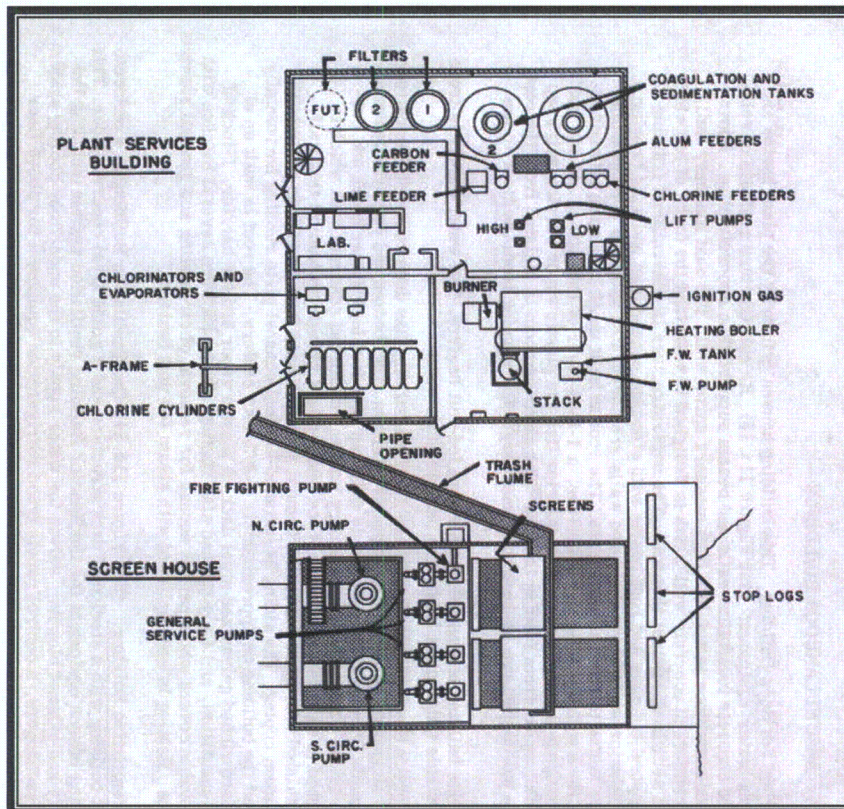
Plans for screen house and plant service building (Courtesy DECo)
